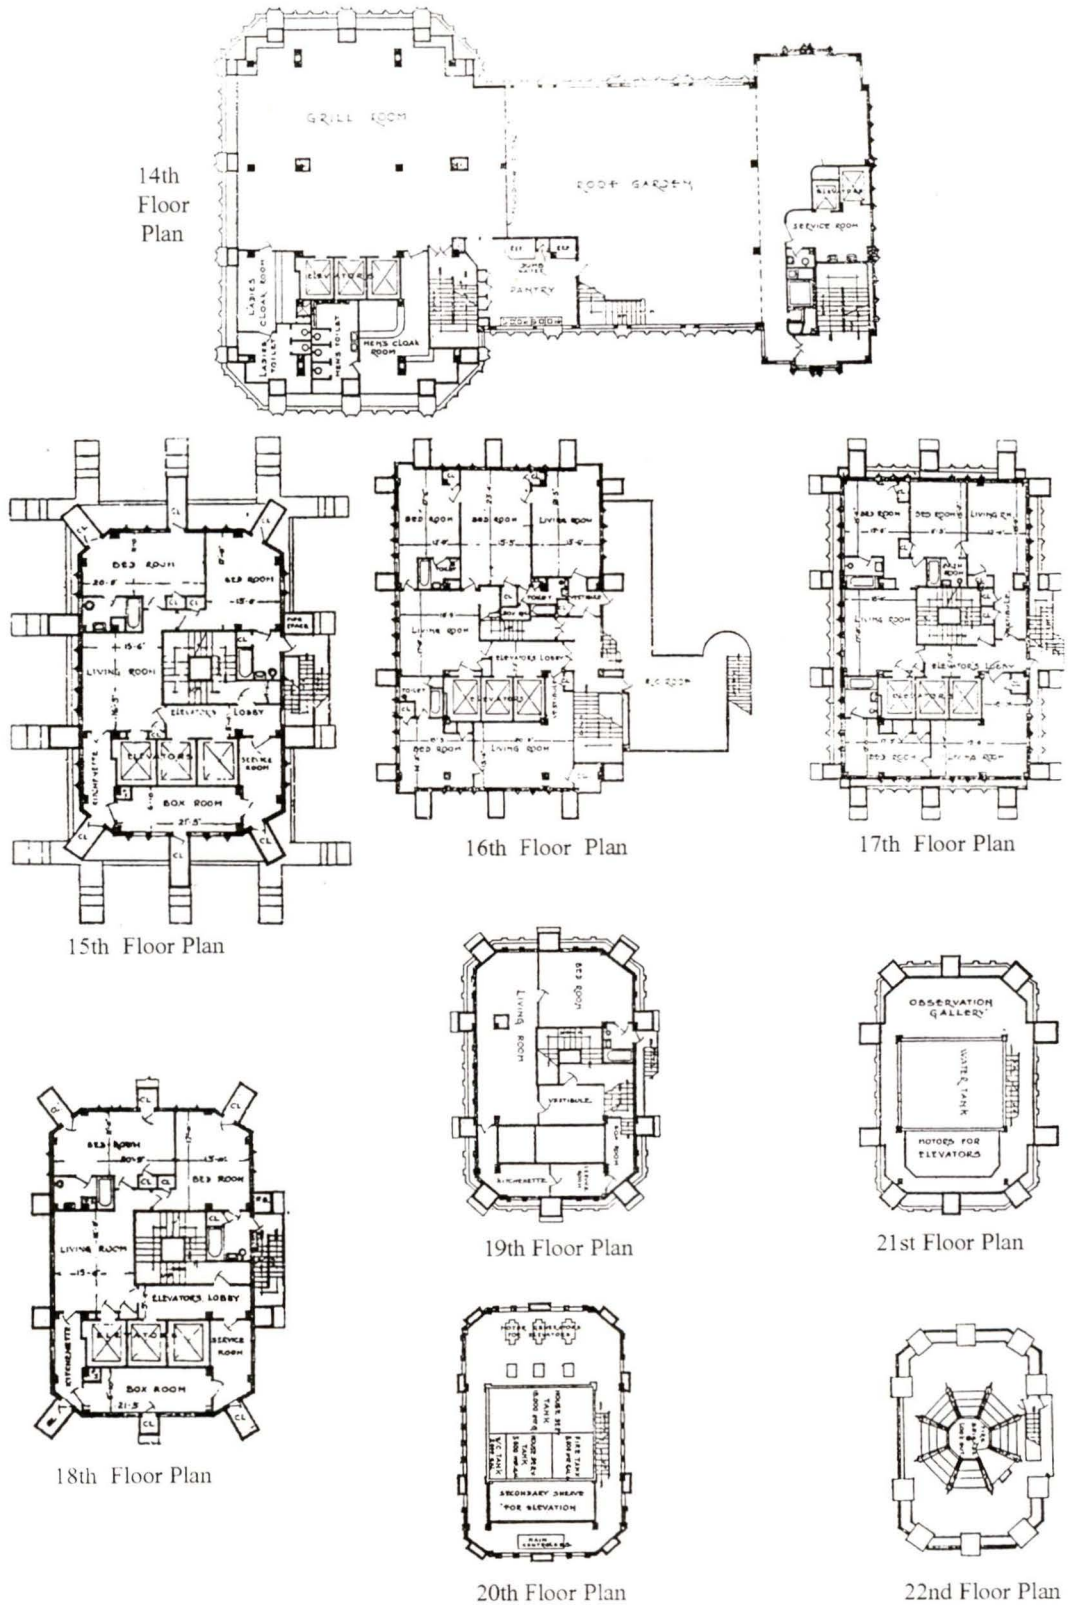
L.E. Hudec. Park Hotel floor plans: Fourteenth to twenty-second floors.
